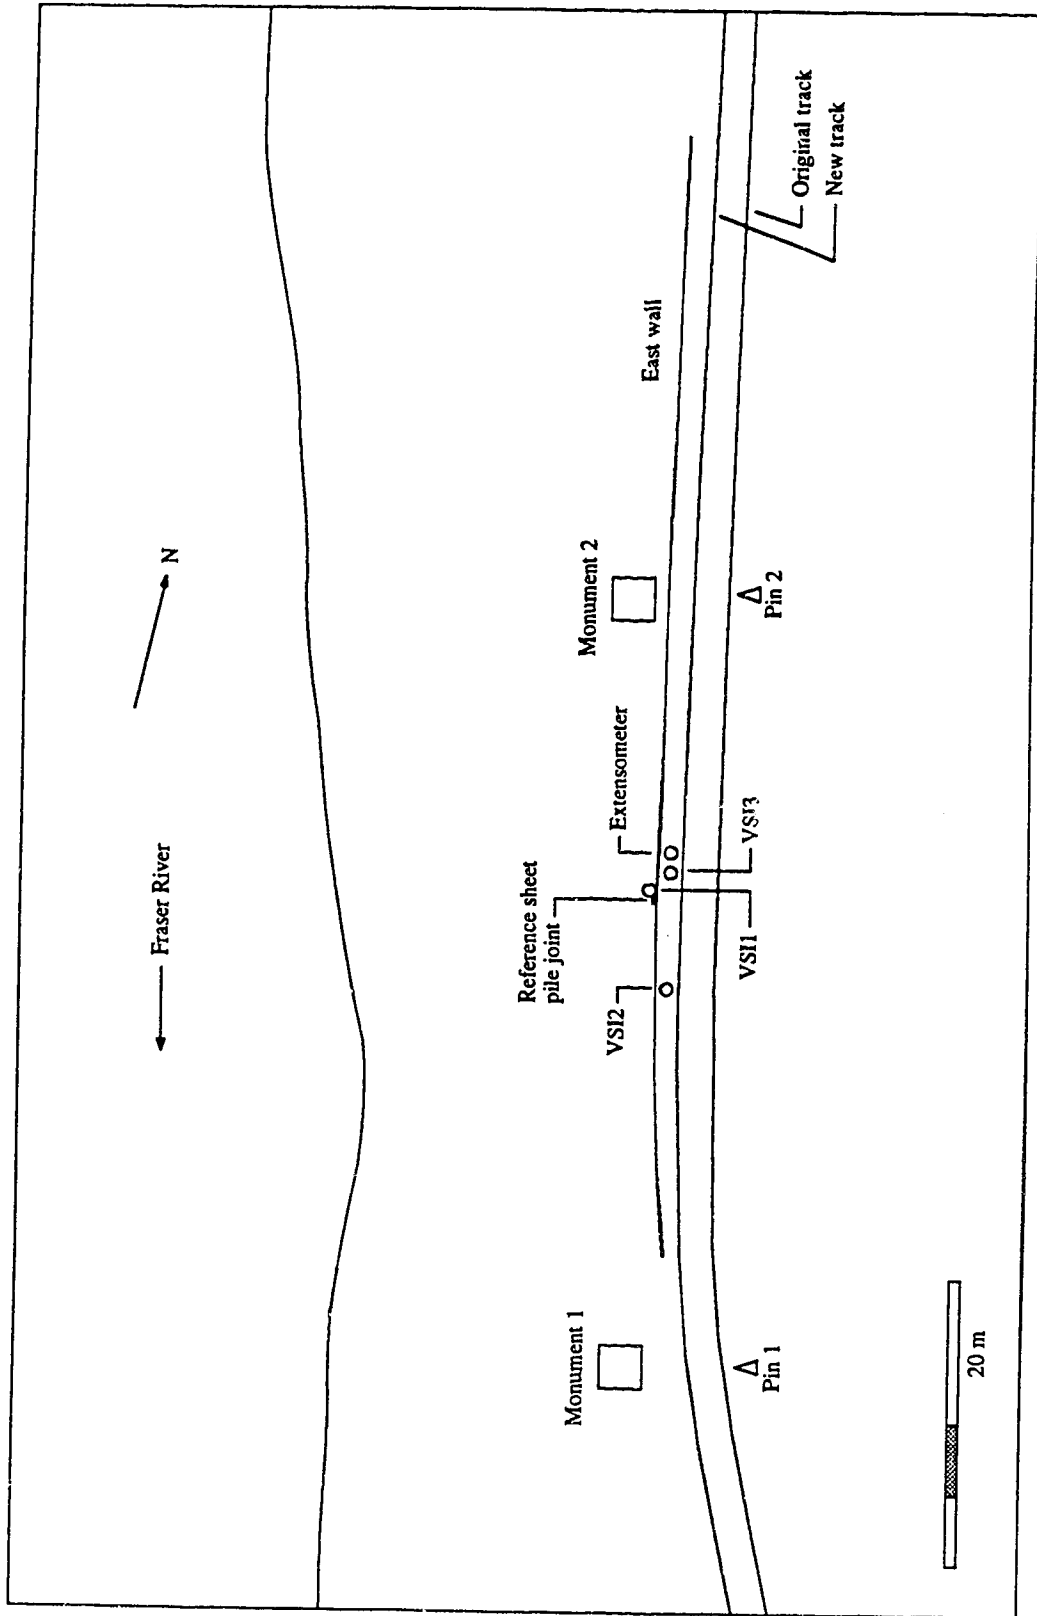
Plan view of east wall showing surface instrumentation installed.
